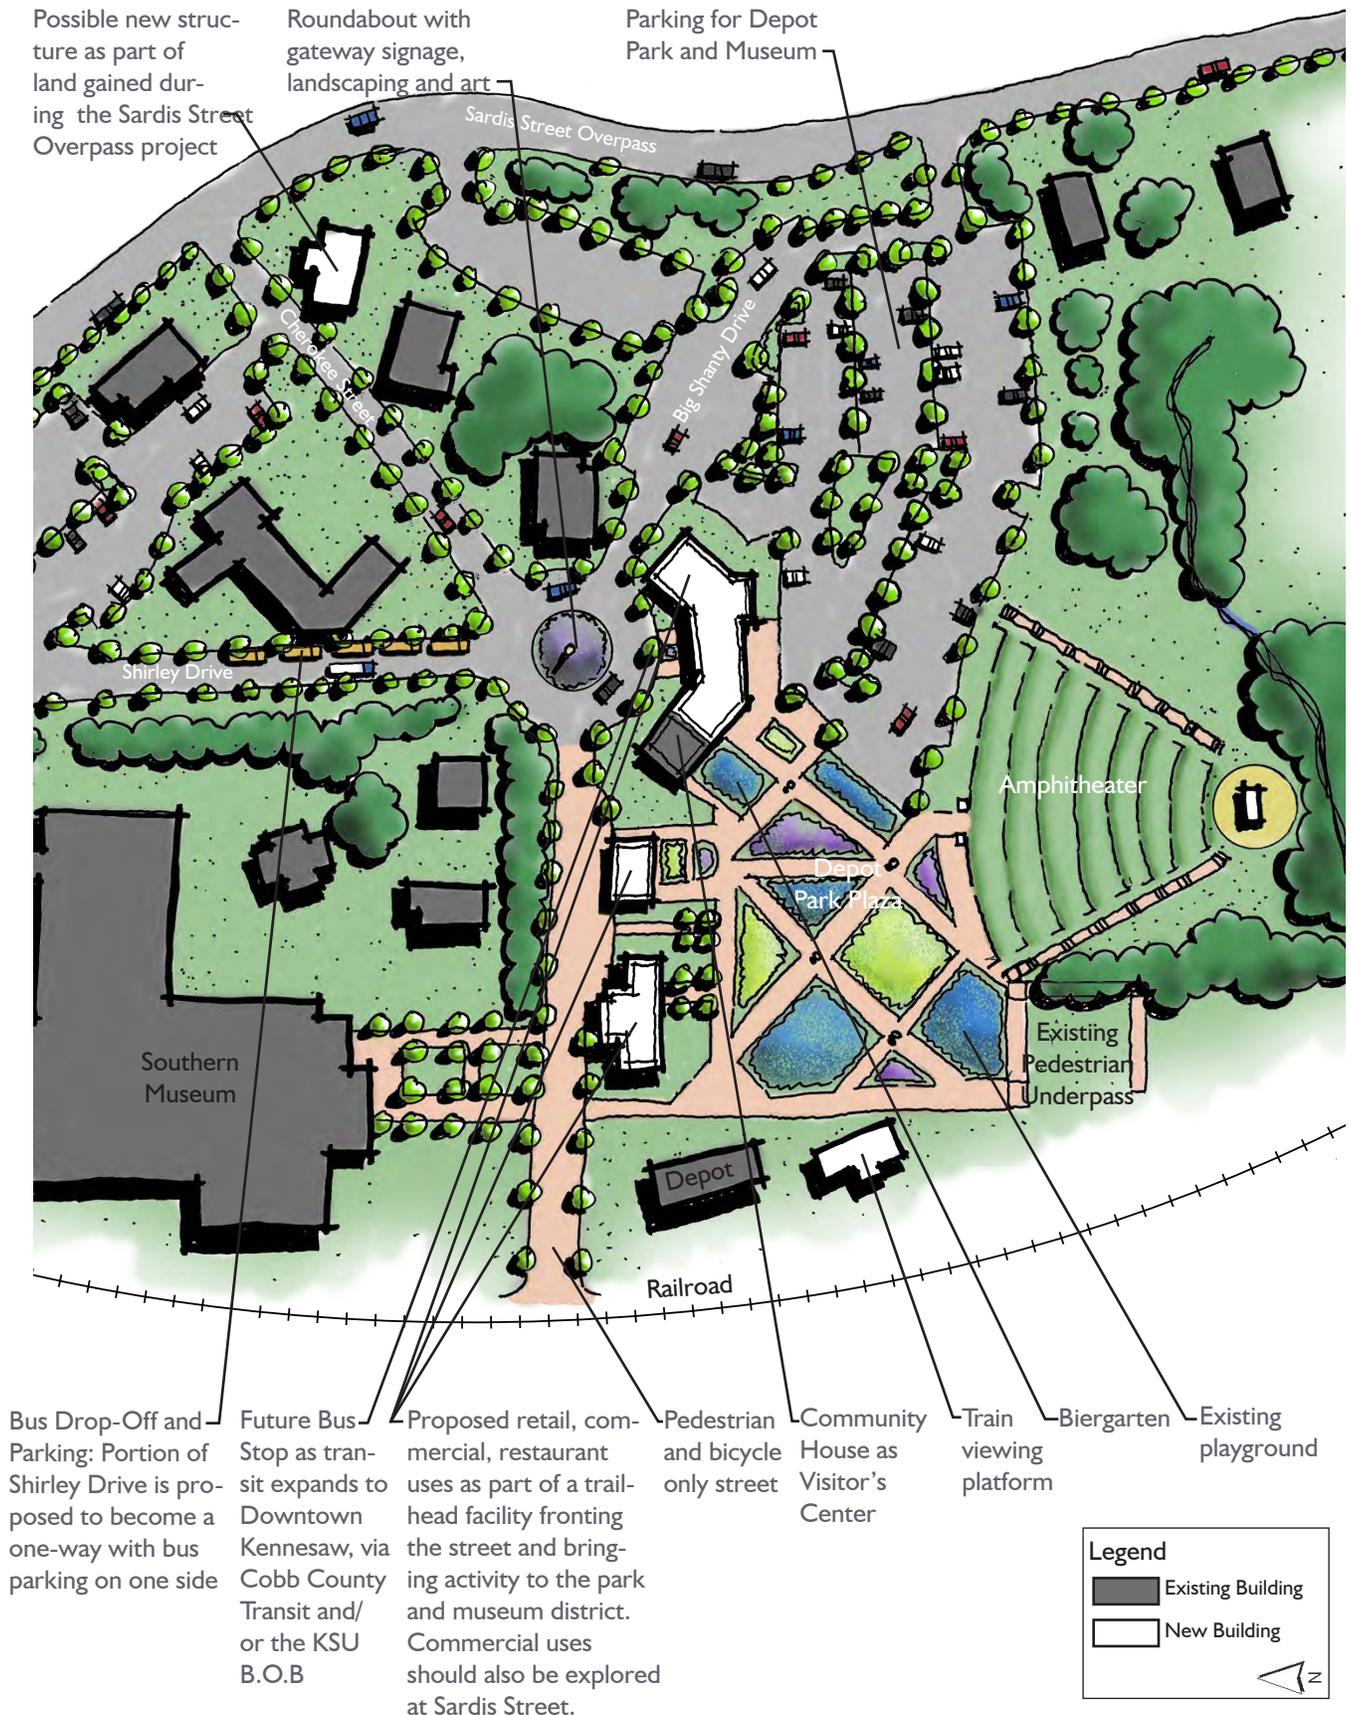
Depot Park Conceptual Plan. This plan is a conceptual drawing only. Ideas expressed within this plan are encouraged to be considered in the Depot Park master plan design and development.
